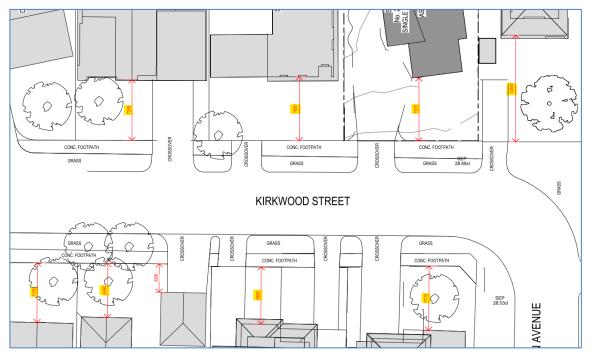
Site plan of the subject site (shaded) and surrounding dwellings within Kirkwood St, with street setbacks highlighted. Setbacks are (left-right, top-bottom): 7.26m, 7.68m, 7.57m, 12.84m, 7.15m, 6.48m, 6.86m, 7.72m.
